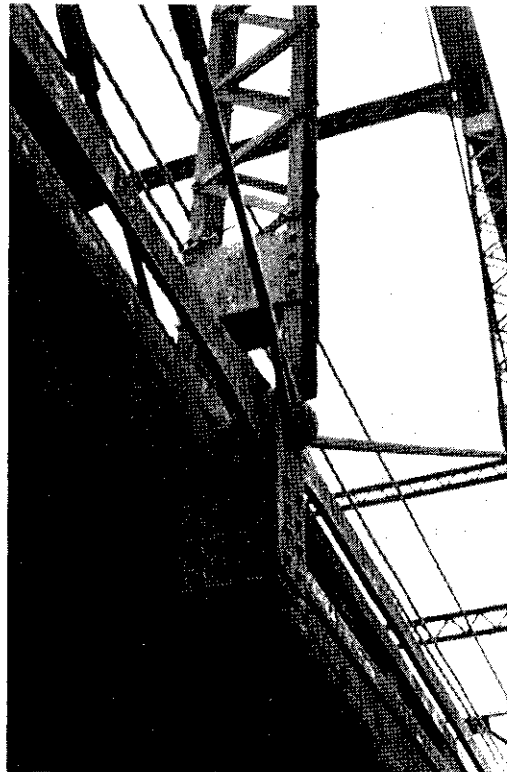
Photograph of typical connection of floorbeam to truss at vertical laced channel member.
